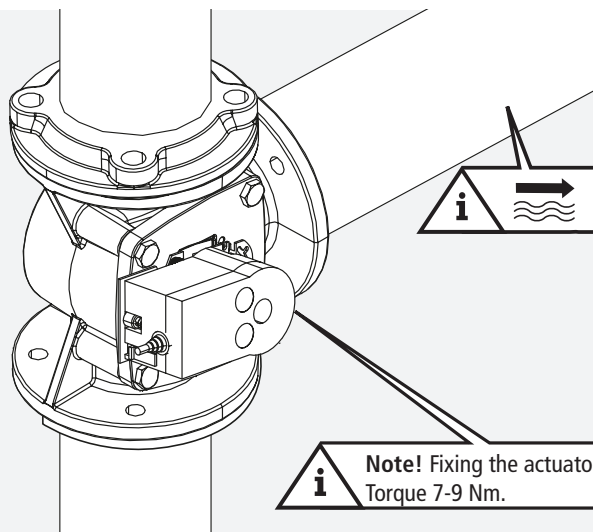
Fixing the actuator: Torque 7-9 Nm.
